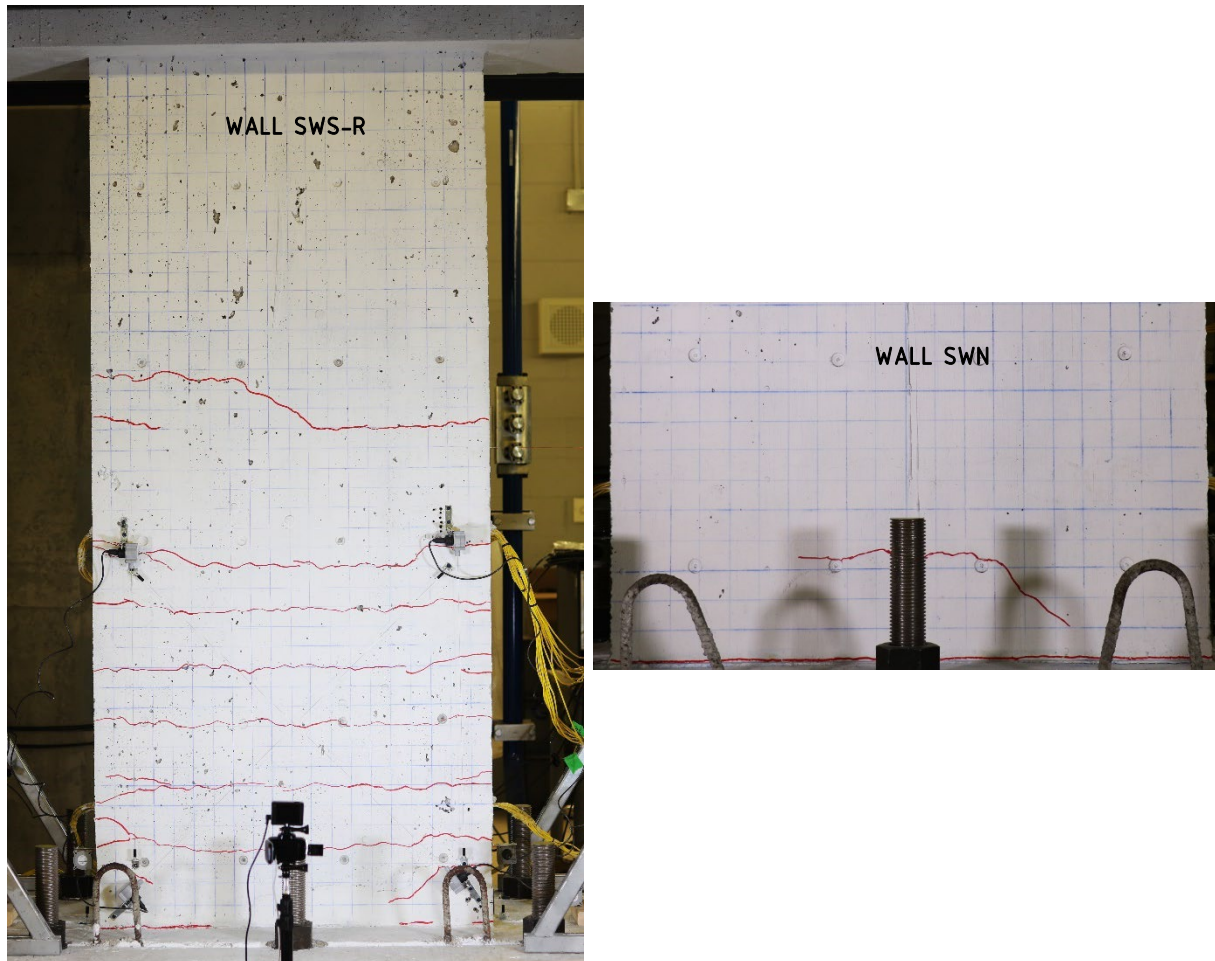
First shear cracks on walls SWS-R (left) and SWN (right).
